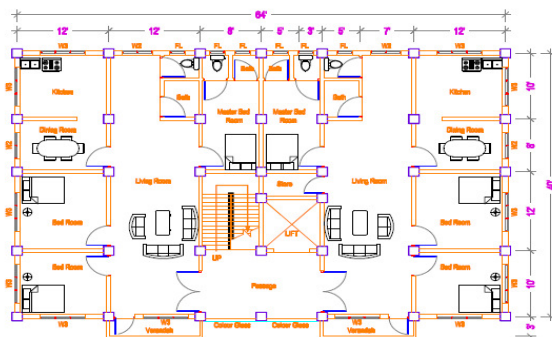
Typical Floor Plan of 2-unit 16-storeyed Building
